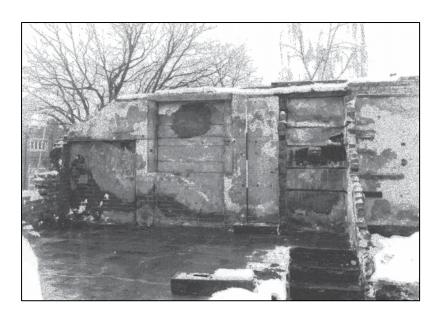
Building D, W wall of S GF room and stair after partial demolition, looking SW (photo 6/14).
